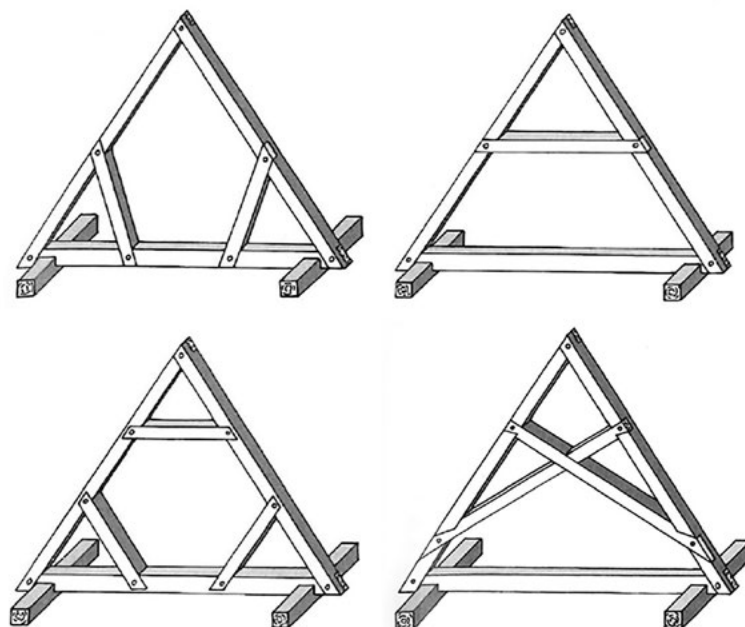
Example of rafter roof with rafter bracing, collar tie, and combination of both
